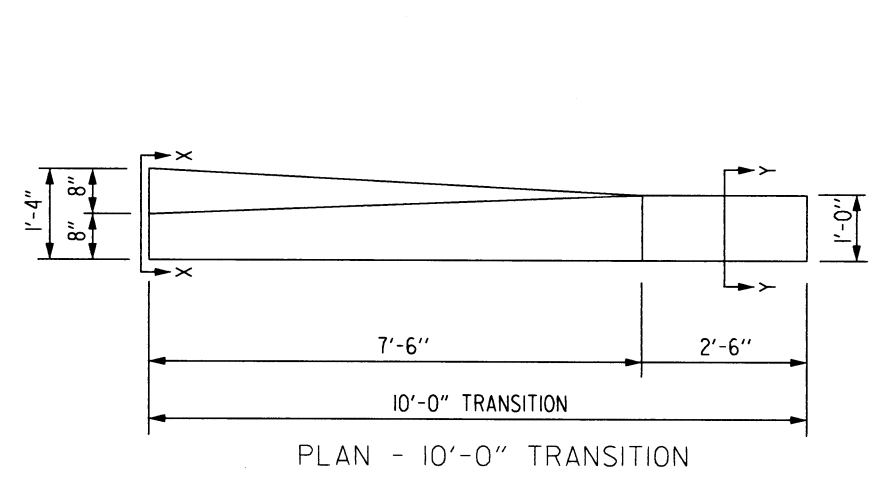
DETAIL OF BARRIER TRANSITION AT PIER PROTECTION TYPE A (N.T.S.)
